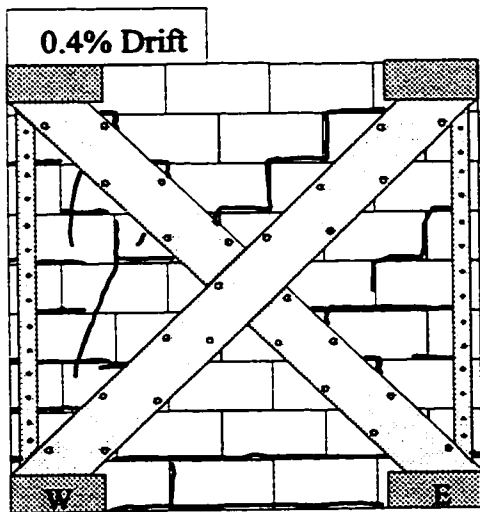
Cracking width for Wall 9 at higher drifts
